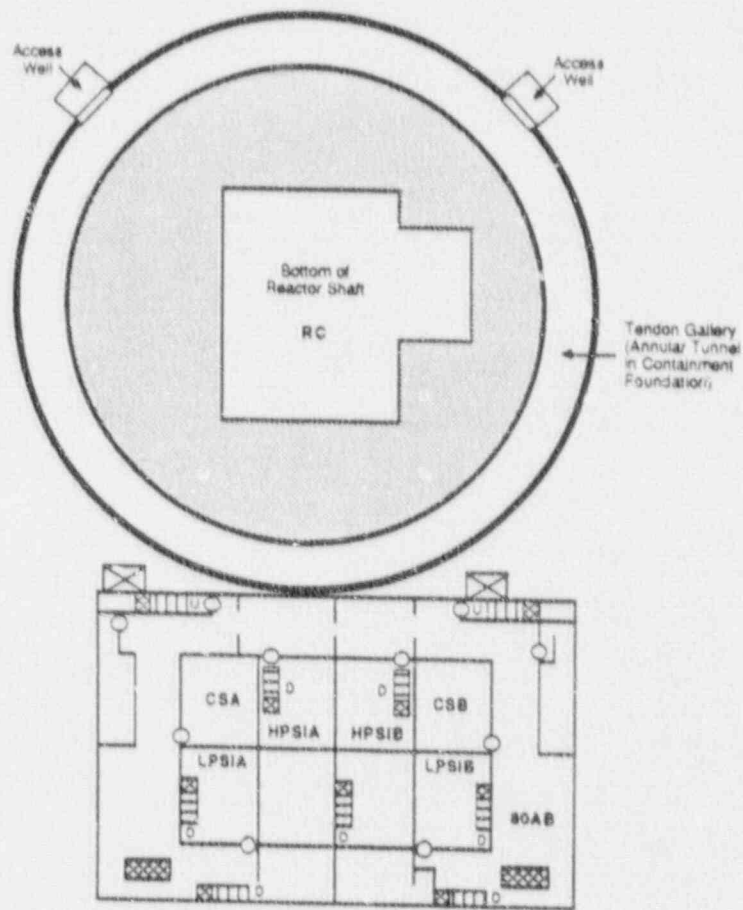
Palo Verde Power Block (Except Turbine Building), 51 ft., 6 in. Elevation
